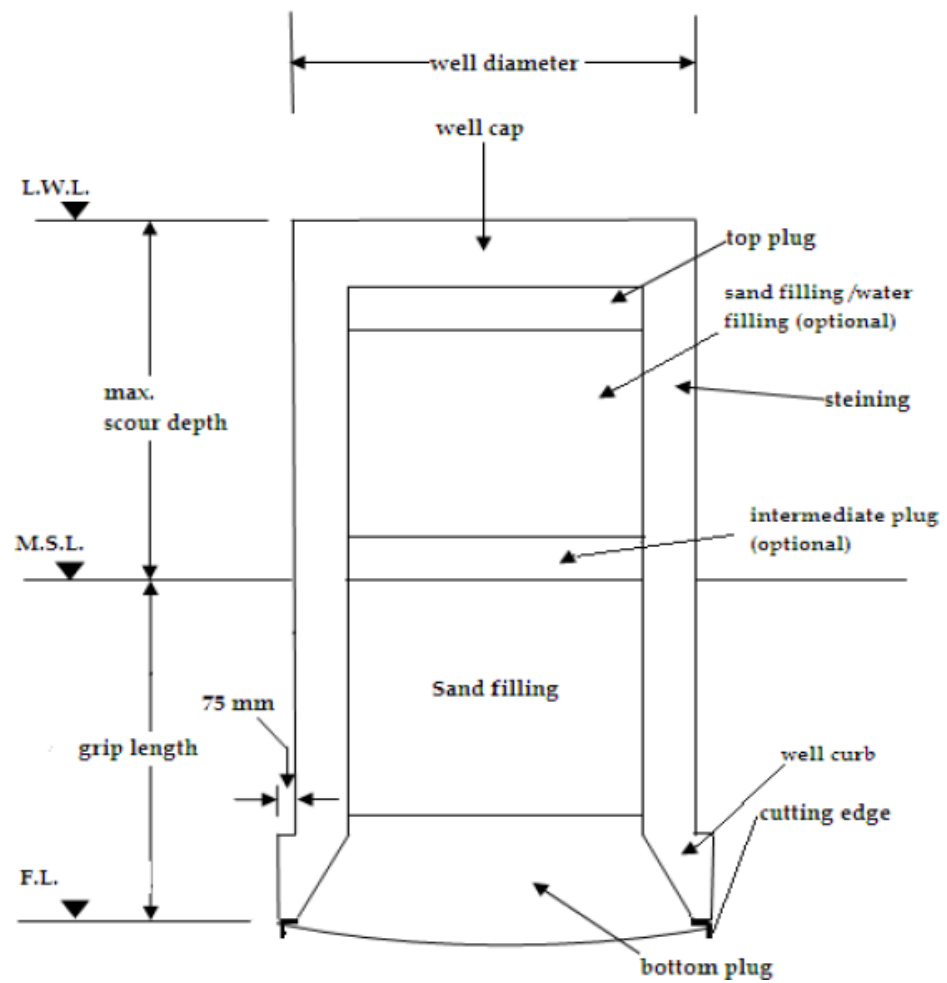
2 Elements of well foundation (Jagadeesh and Jayaram 2009)
